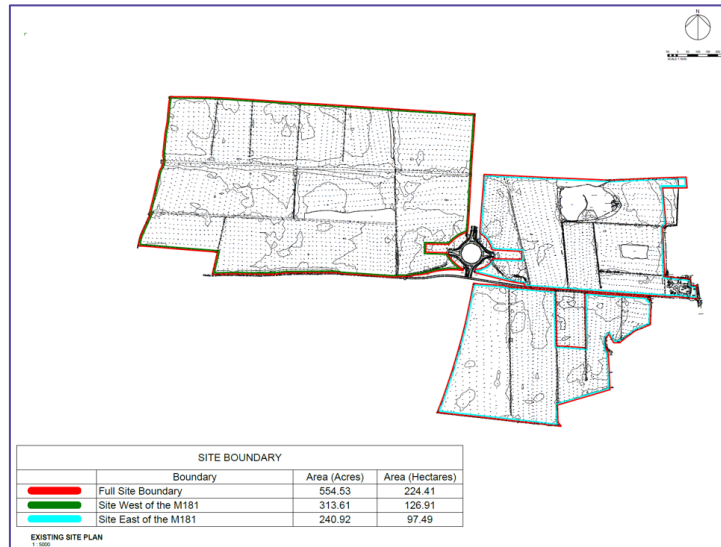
A plan showing the extent of the Lincolnshire Lakes (North) Site Location Plan and areas of Hargreaves Land's Ownership
